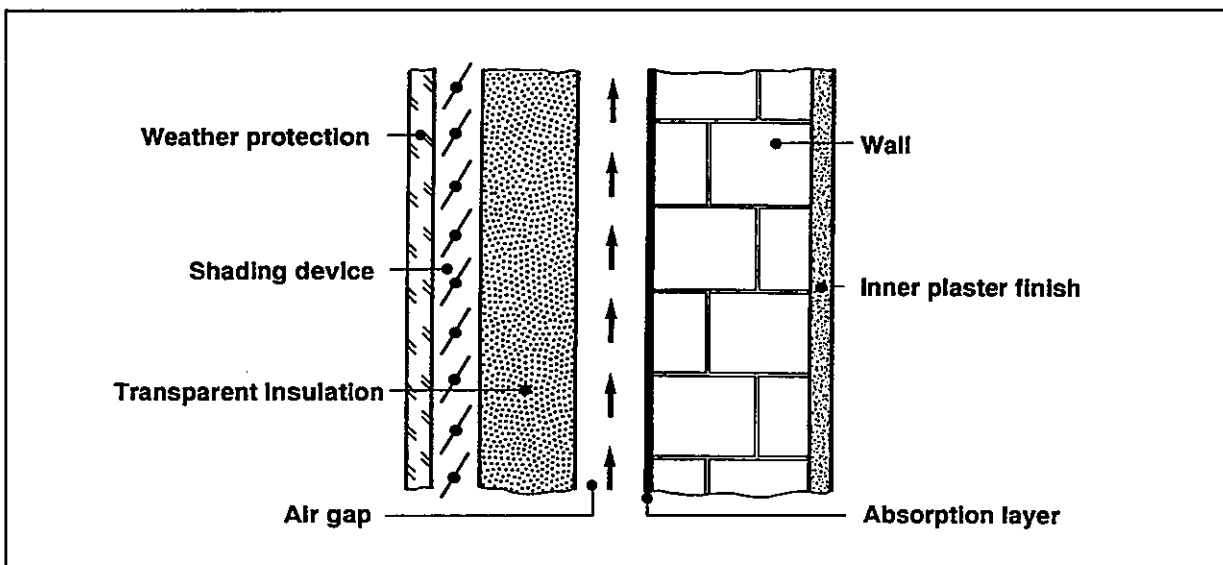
Transparent Insulation systems installation with air gap between insulation layer and wall.
